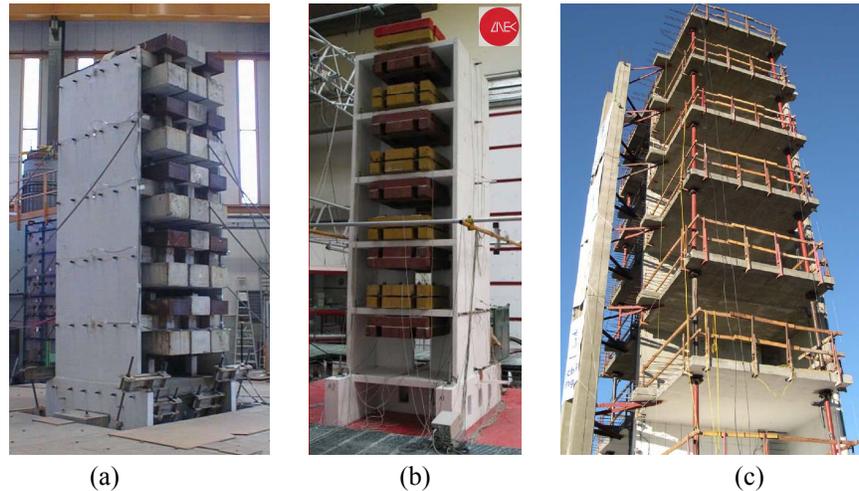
Large-scale models tested on shake-tables (a) CAMUS-3 - Cantilever wall designed according to EC8, (b) ECOLEADER-SLO - Lightly reinforced coupled wall designed according to the Slovenian practice, (c) UC San Diego - Full-scale model of a 7-story building slice.
